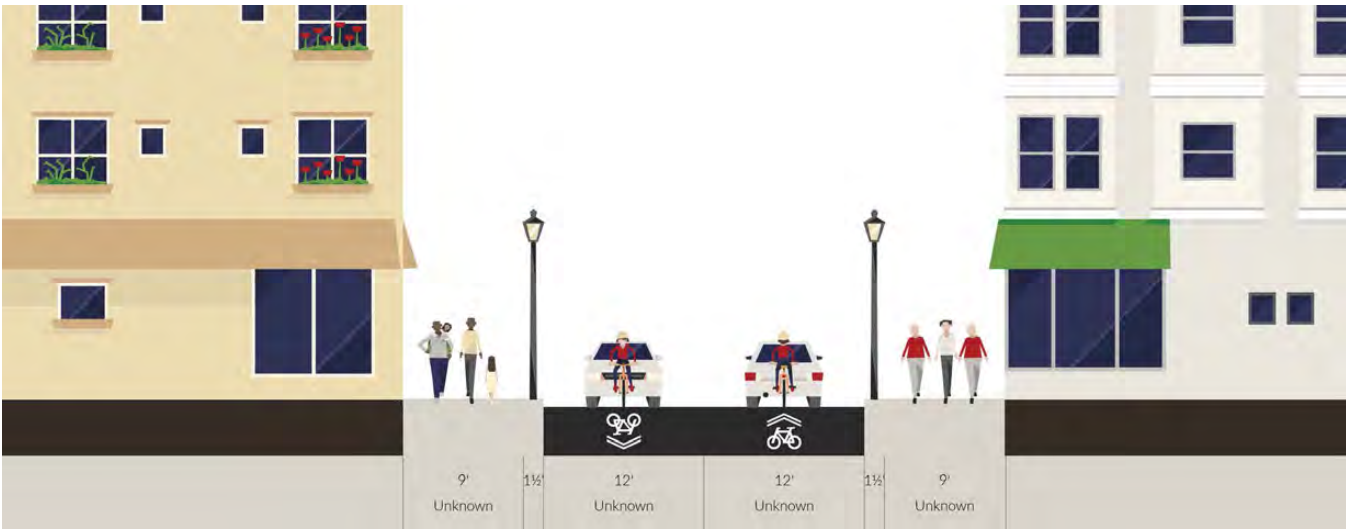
Cross Section: Cabarrus Ave. – Spring St. to Church St. (Downtown Boundary)
